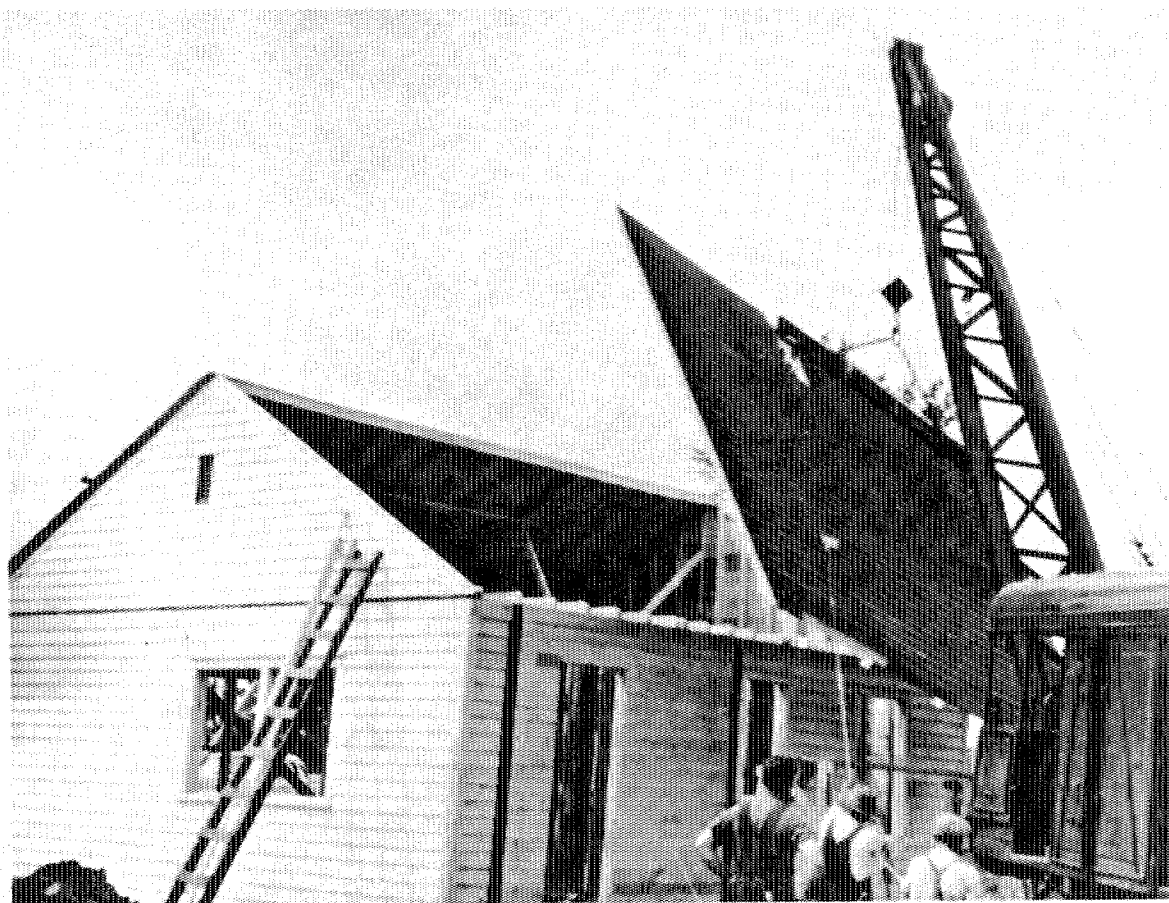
This 1941 photograph shows a roof panel being hoisted into place on a wartime house in Moncton, New Brunswick.
